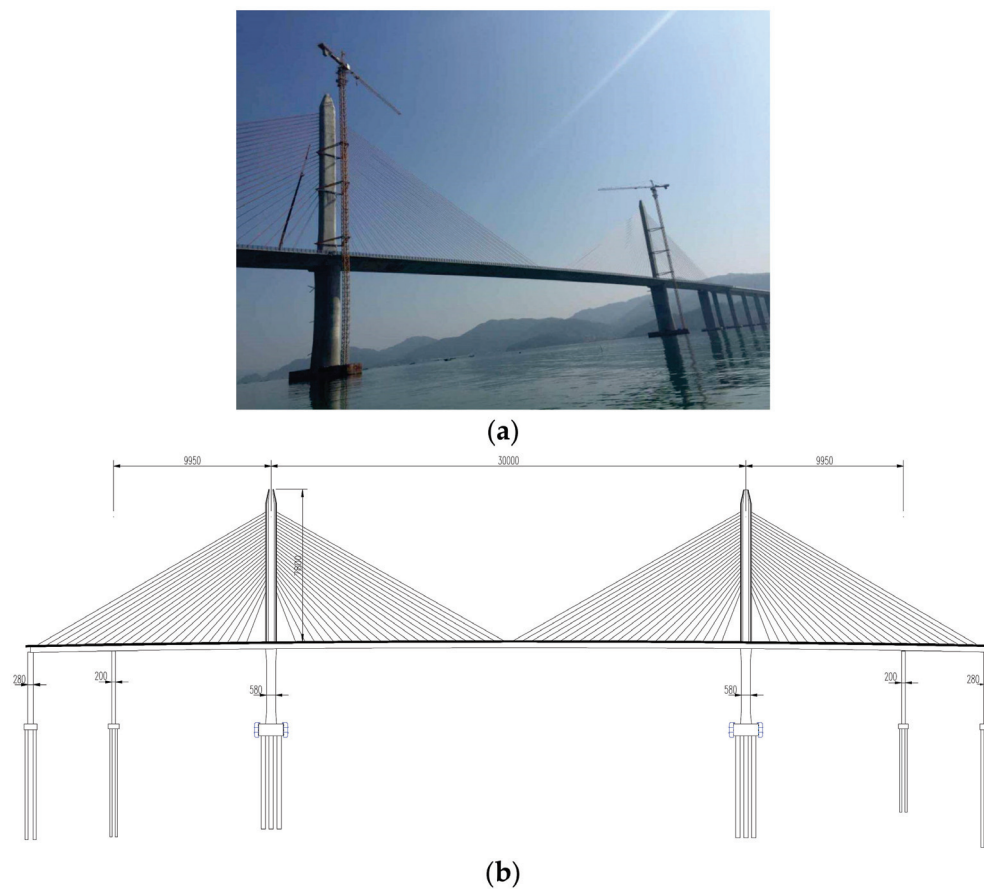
Photo and elevation view of the cable-stayed bridge. (a) The side elevation photo of the bridge during construction. (b) Elevation view.
